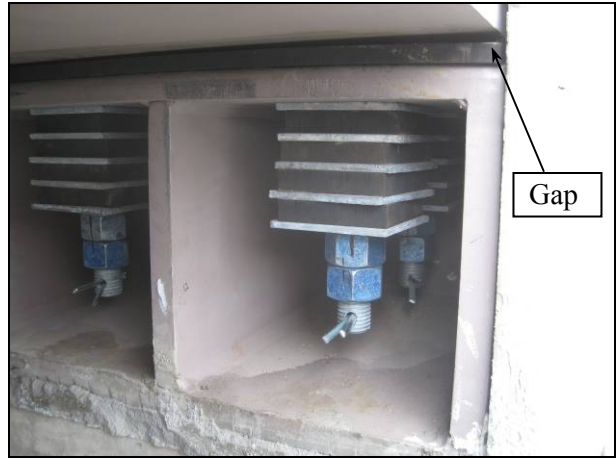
Gap between steel plate and channel assembly (note concrete repair).
